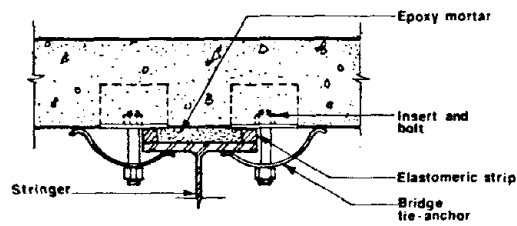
Connection of slab to stringer, Clark's Summit bridge.
